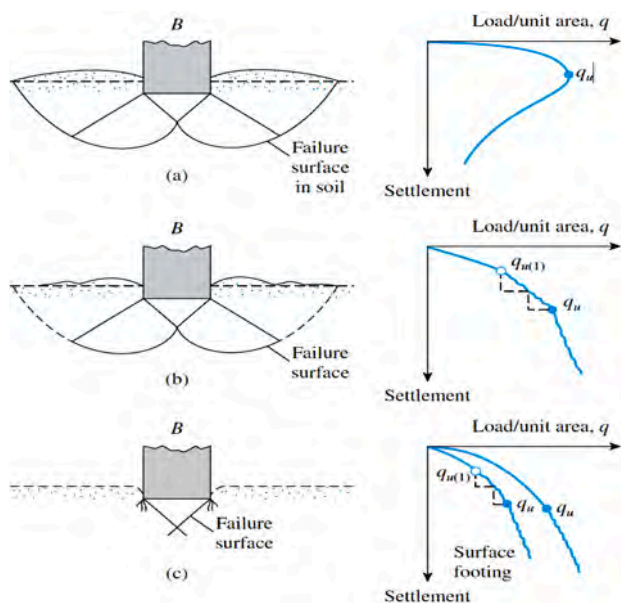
Failure mechanism of soil under shallow foundations: (a) general shear failure (b) local shear failure (c) punching shear failure [25, 26].
